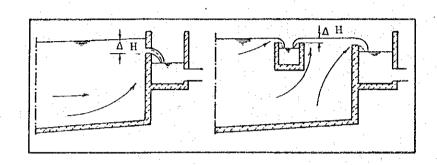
Effluent Arrangement (Ref. Book No. 1)
